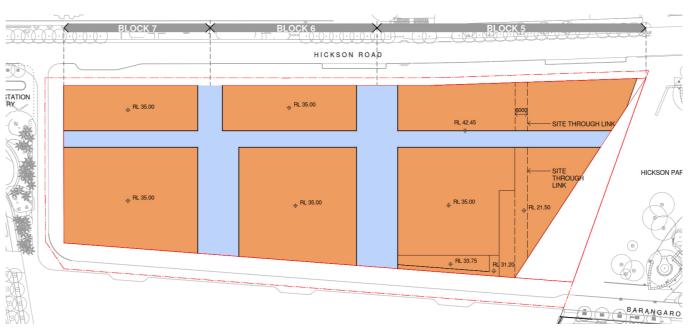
Plan diagram of MOD 9 -RtS with building heights (Source: SJB diagrams (October 2023))
